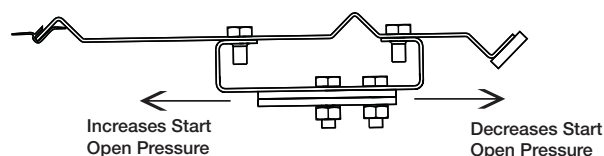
Counterweight adjustment for start open pressure. Blade is shown in full close position
